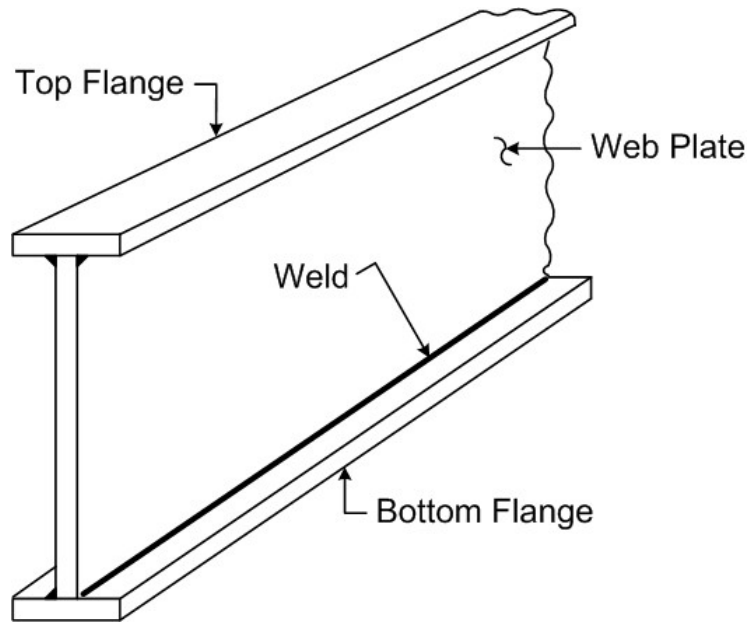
Built-up Welded Plate Girder
